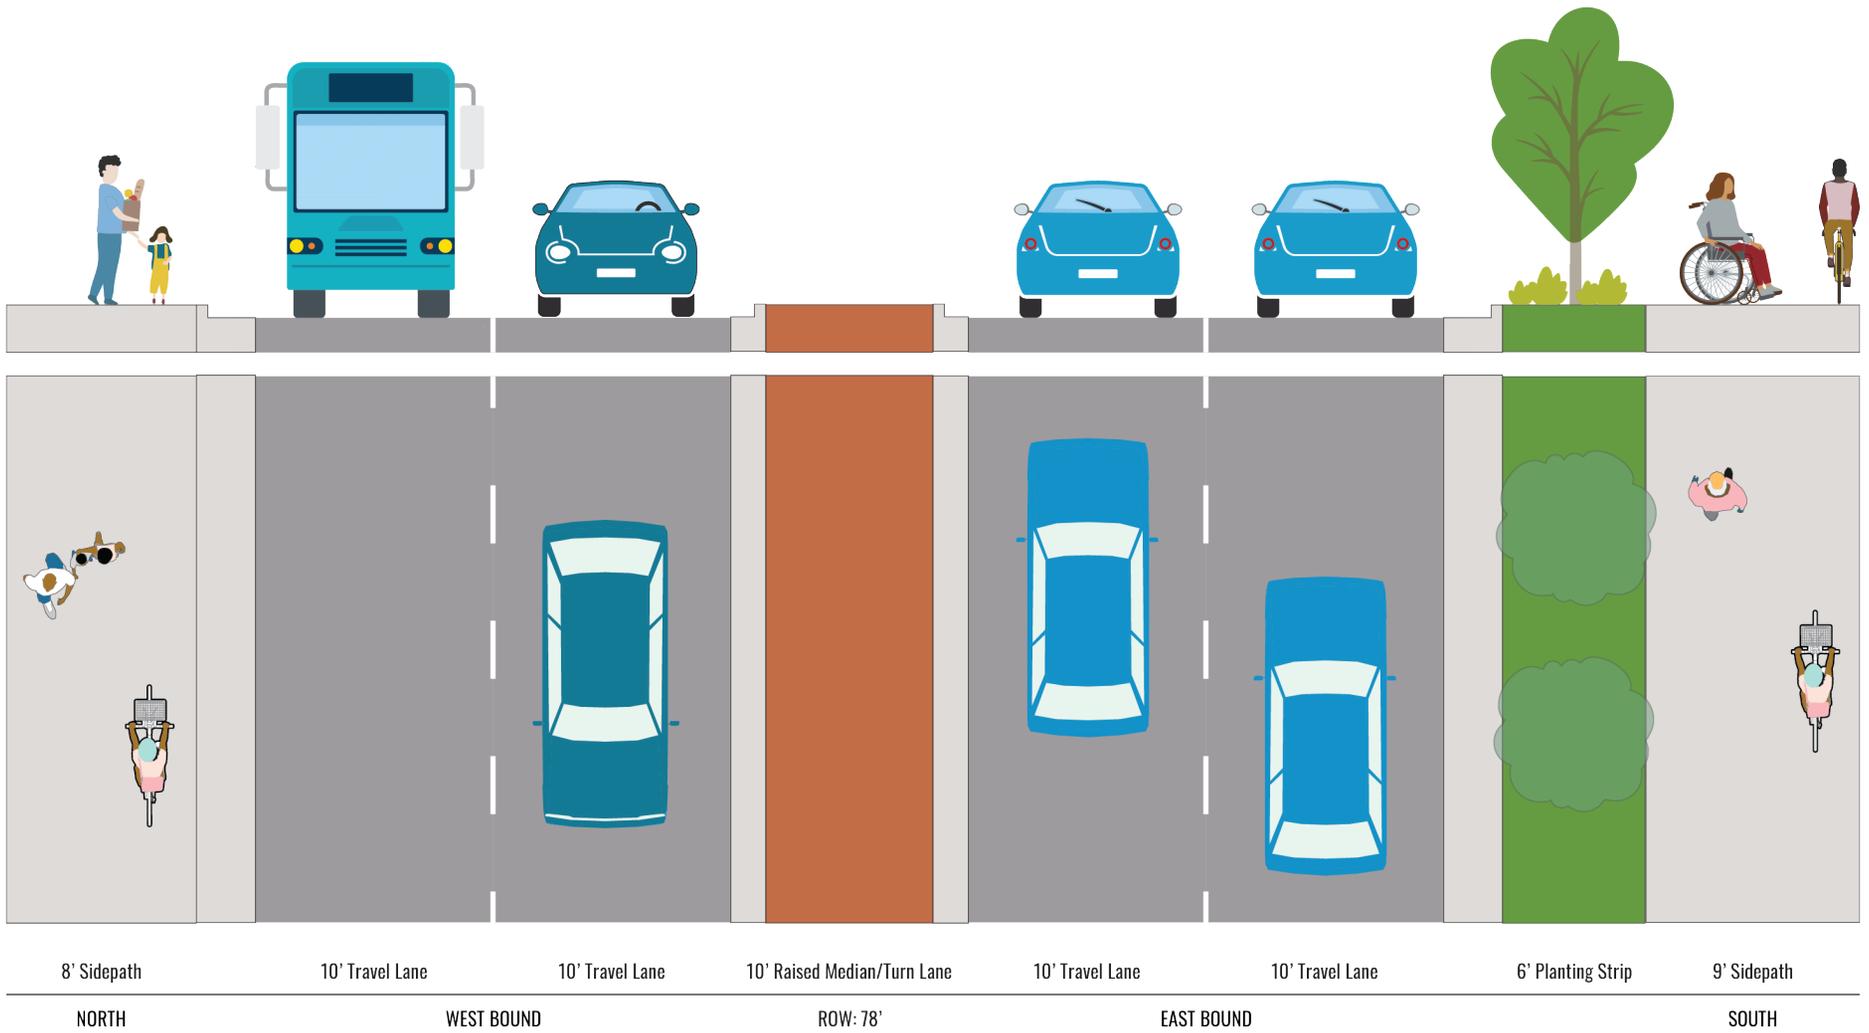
Segment A recommended alternative — Roundabouts to 4th Avenue
